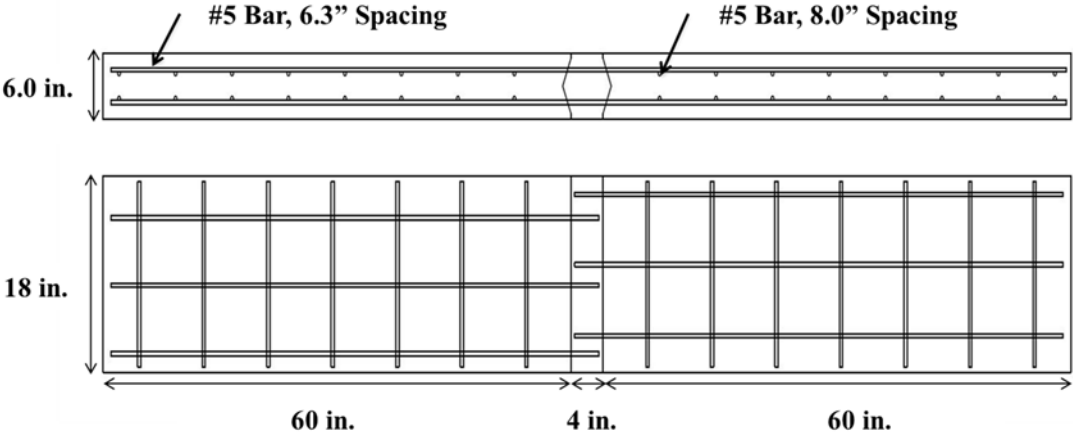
Construction and Reinforcement Details for Precast Decks with UHPC Joint
